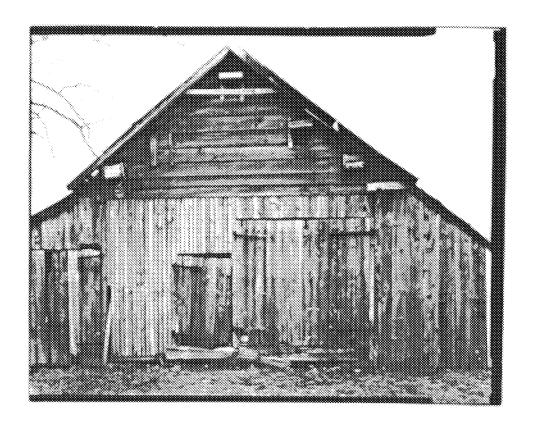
Grasslands, view of northwest elevation of barn, looking southeast.
